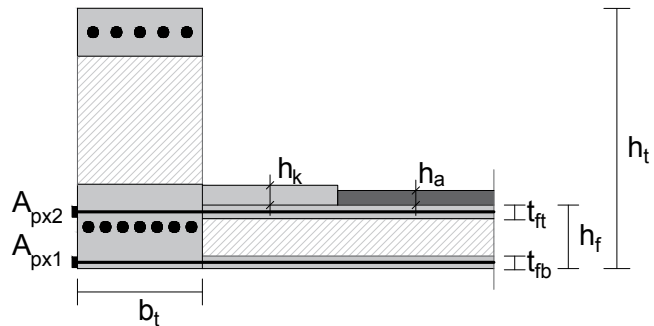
Detailed view of the floor-to-side connection in the open structure design with indicated prestressing
